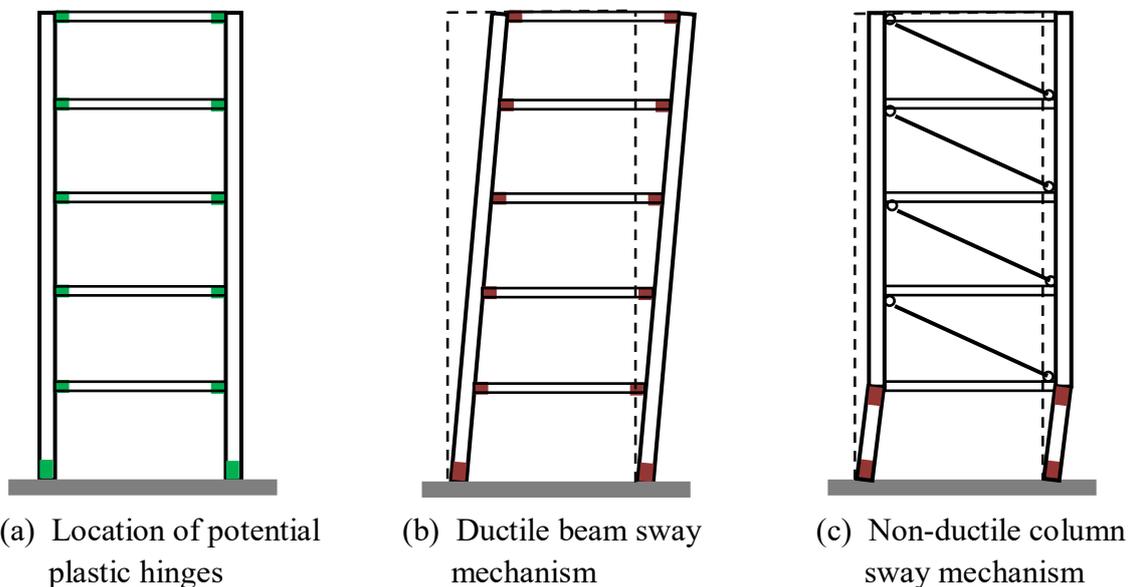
Typical sway mechanisms of beam and column of RC building frame
